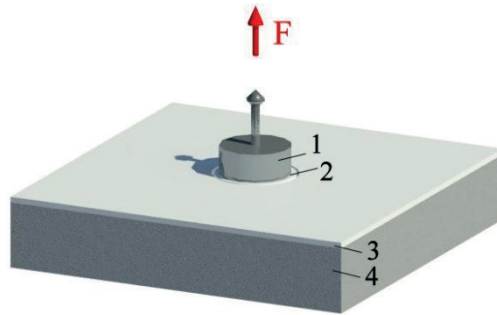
Peeling off the disc (1 – steel disc, 2 – epoxy adhesive, 3 – epoxy resin coating, 4 – concrete substrate)
